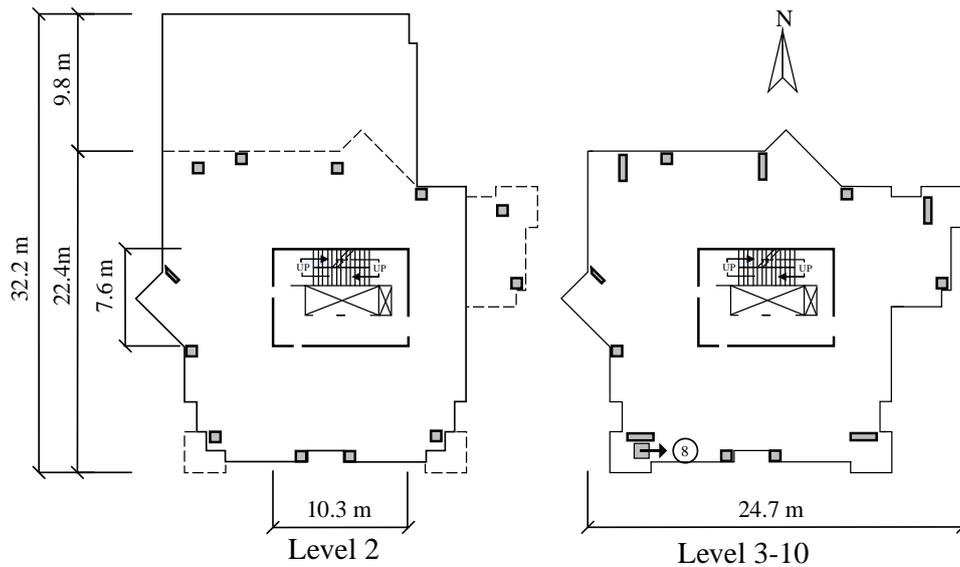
Level 2 (left) and level 3-10 (right) floor layout of the City Crest Tower.
